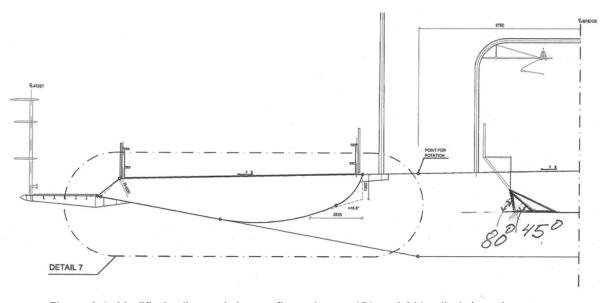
Modified railway girder configurations – 45° and 80° rail girder edge.
